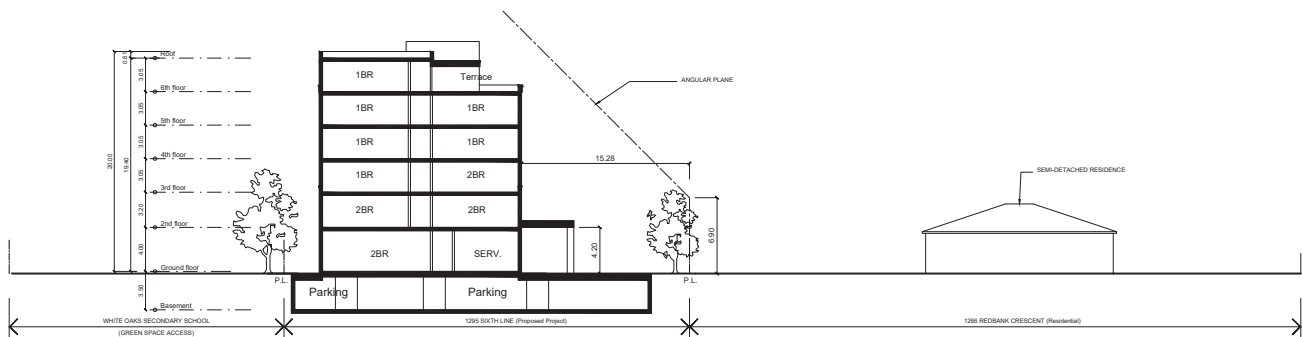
Section through the proposed building showing the 45 degree angular plane from the low-rise neighbourhood to the south
